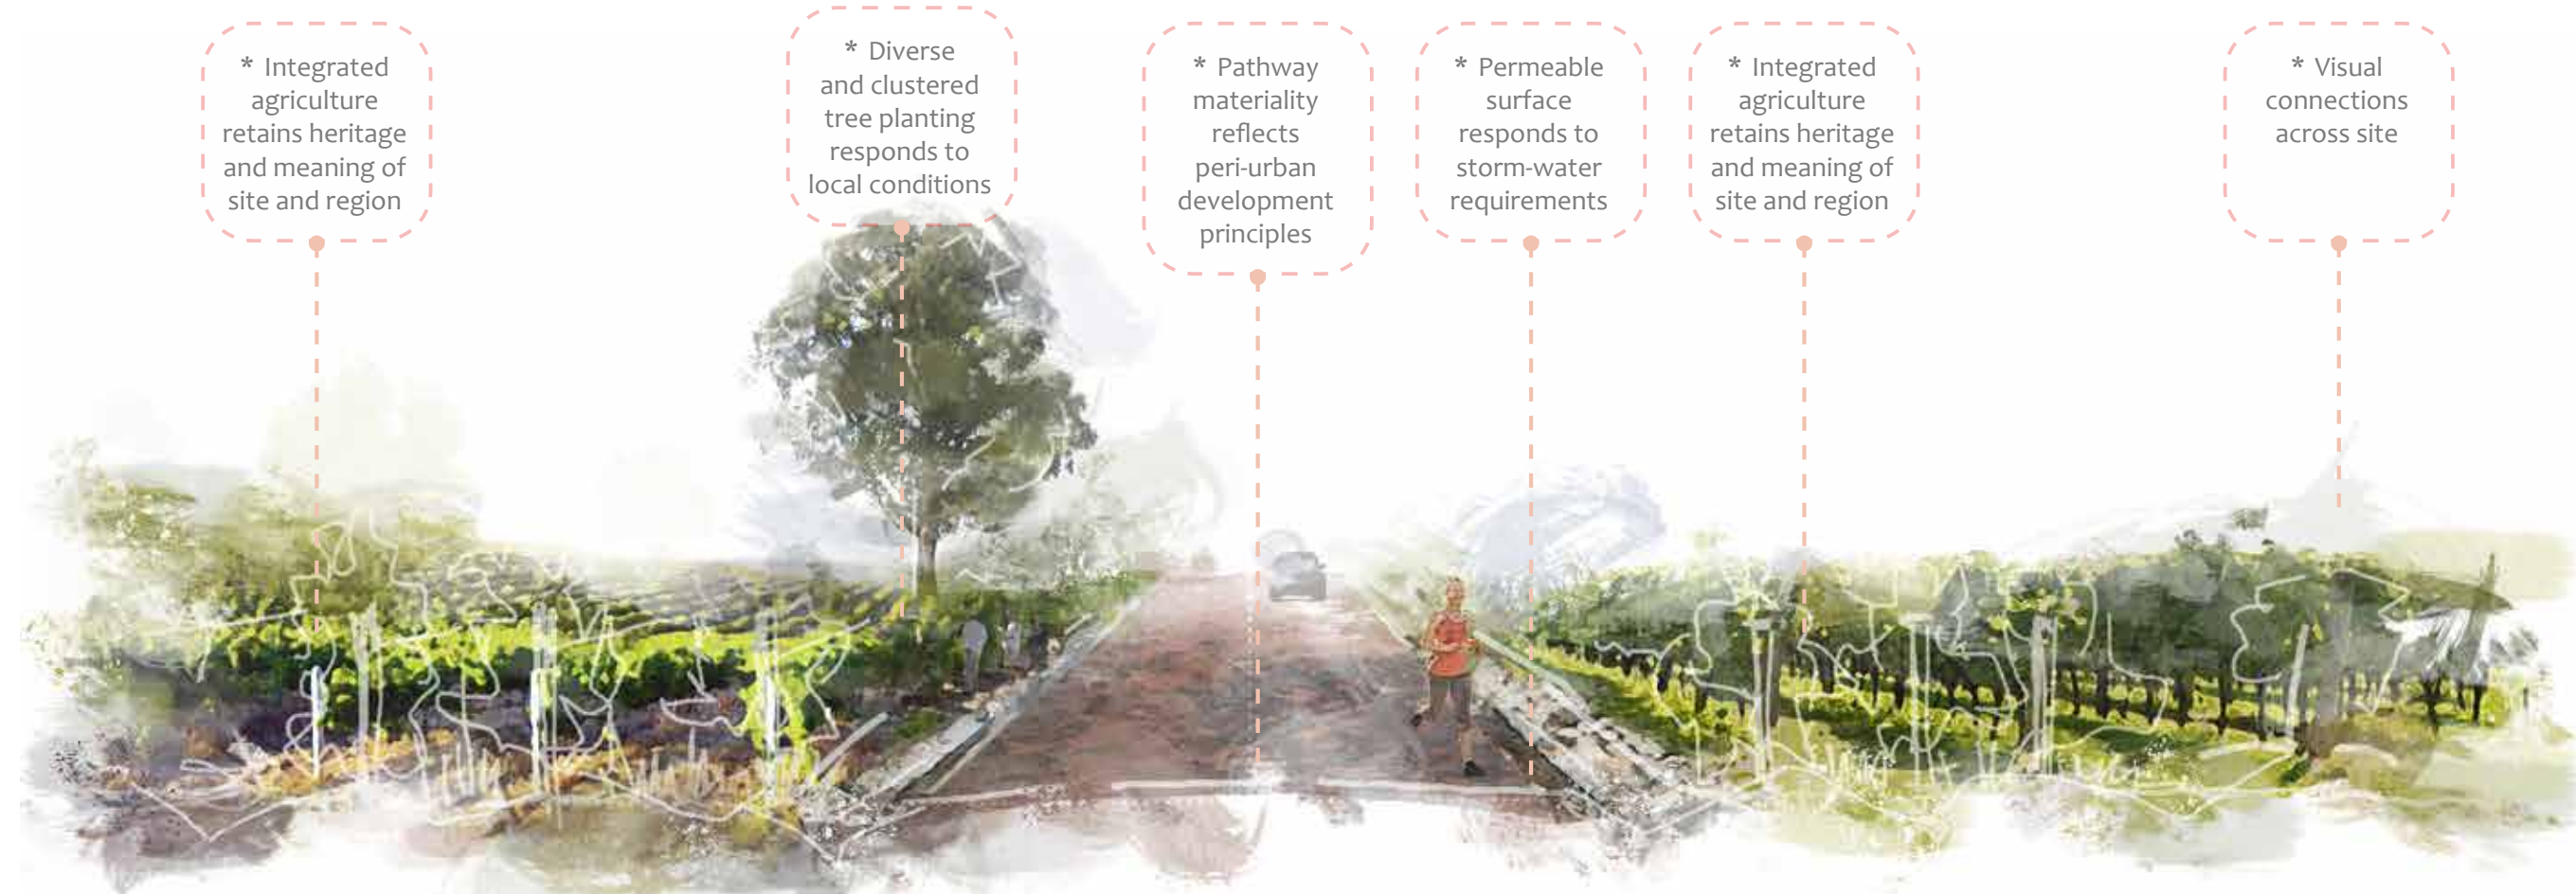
Section 3 - Secondary Access Street along contour with tree clusters
